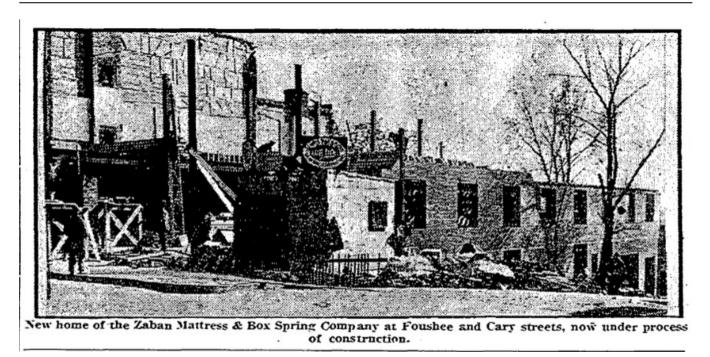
Construction of 1 E. Cary Street in 1933. Note window openings on Foushee Street elevation. *Richmond Times-Dispatch*, April 2, 1933, p. 10.
